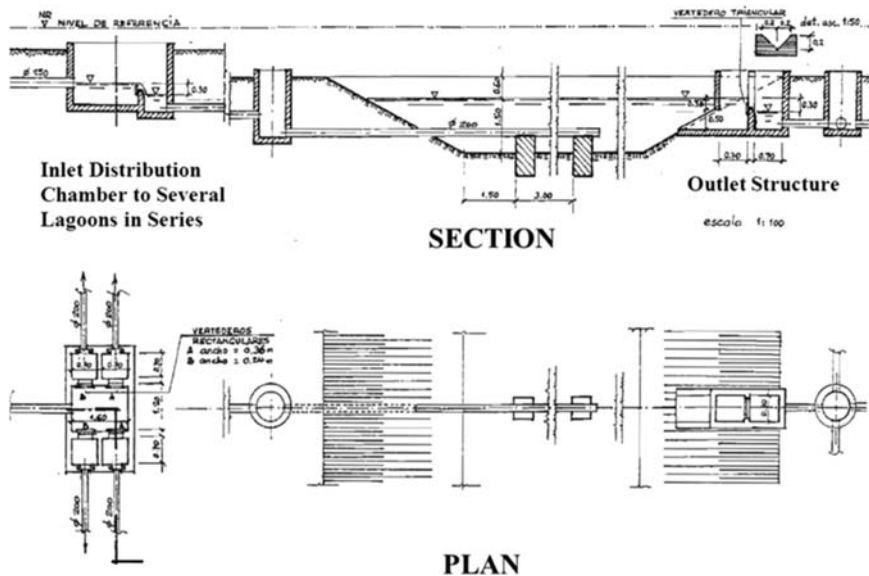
Another type of typical inlet and outlet structures of lagoons
